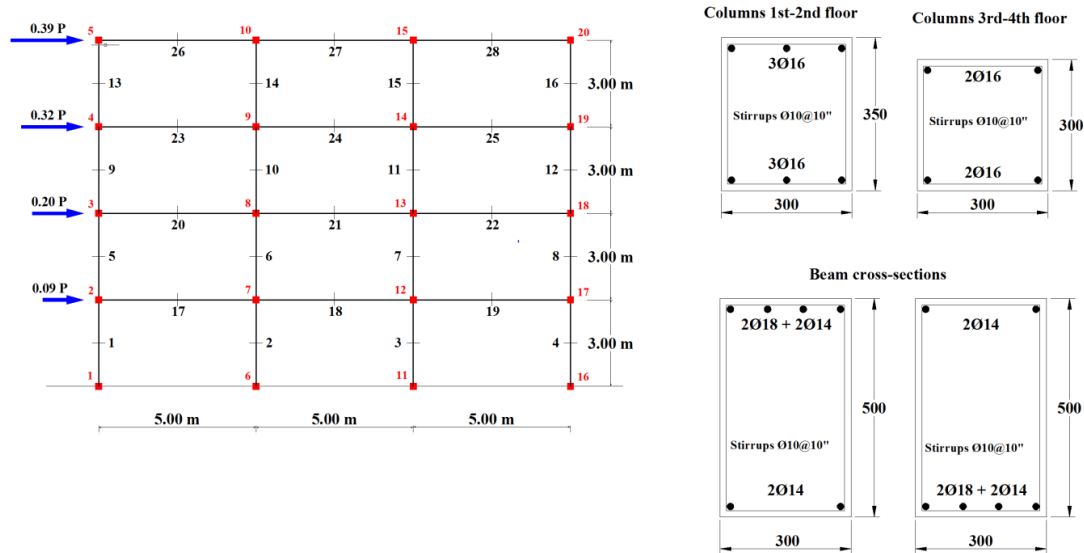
4-floor frame structure: geometry and cross-sections of beam and columns (unwrapped and FRP-wrapped columns).
